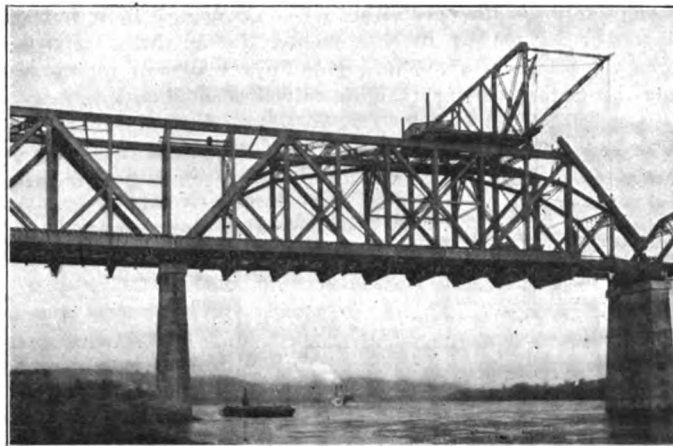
Placing End Post of Span 2 by Cantilever Method Showing Erection Ties Between Spans 1 and 2.
